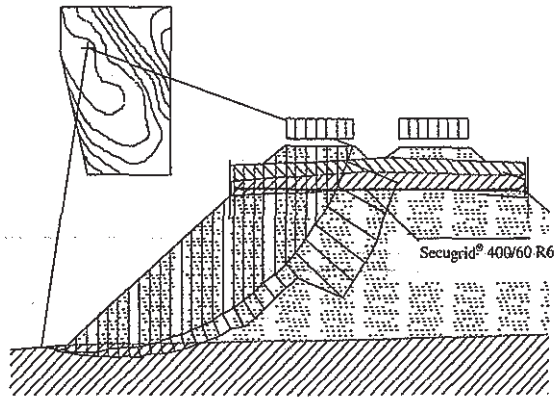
Raised railway dam near Hanover with geogrid reinforcement.
